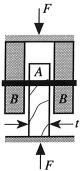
Typical embedment test arrangement. A - specimen, B - steel side plates rigidly clamping fastener.
